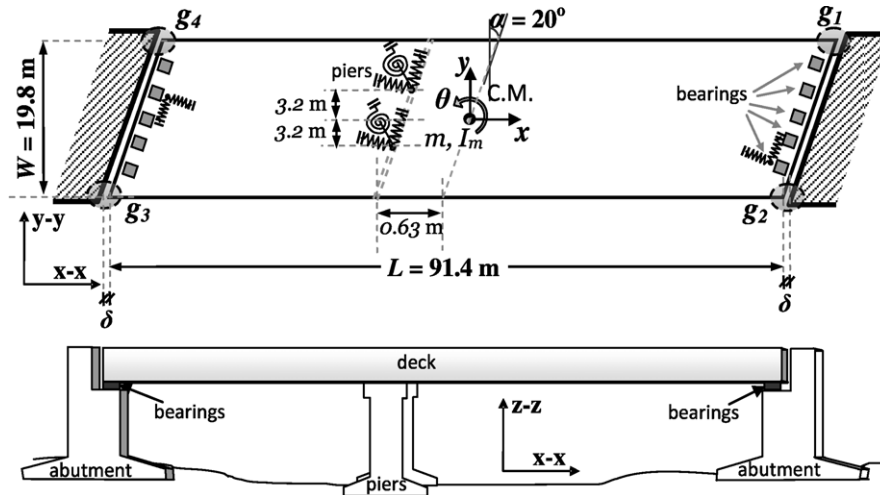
Model of the bridge examined: plan (top) and elevation (bottom). g_1 – g_4 are the potential contact points between the deck (rigid body) and the abutment (inelastic half-space).
